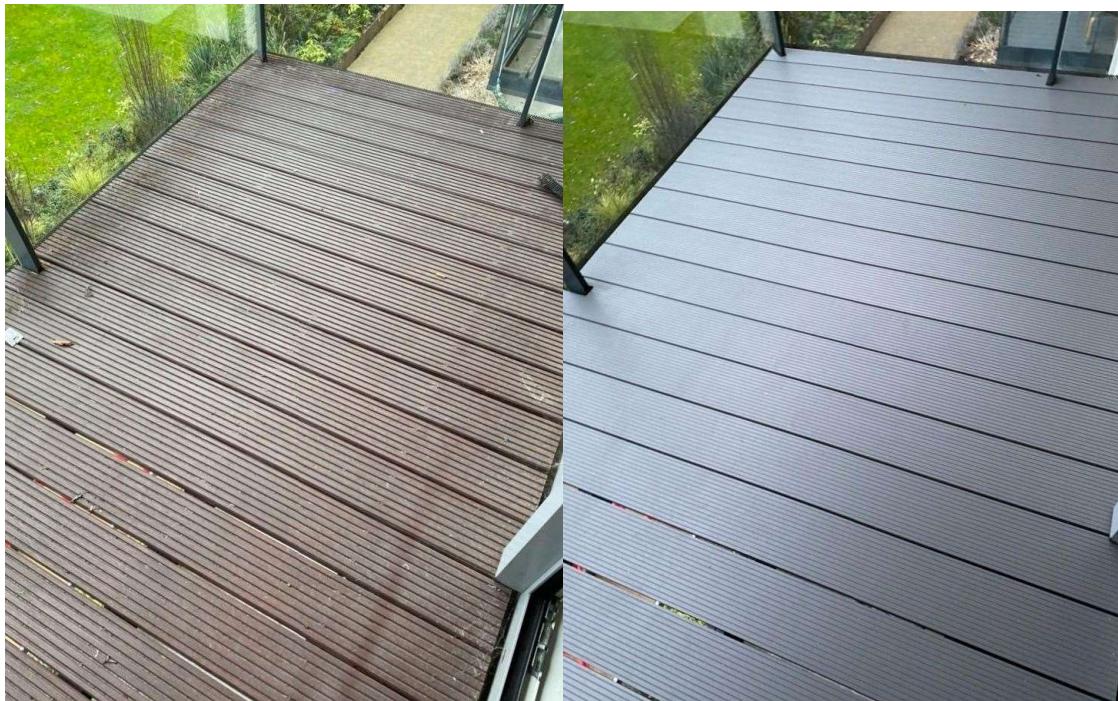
Second Example of a completed balcony decking replacement; the left-hand side photo shows the original timber decking balcony, the right-hand side photo shows the same balcony and the completed aluminium decking replacement.
